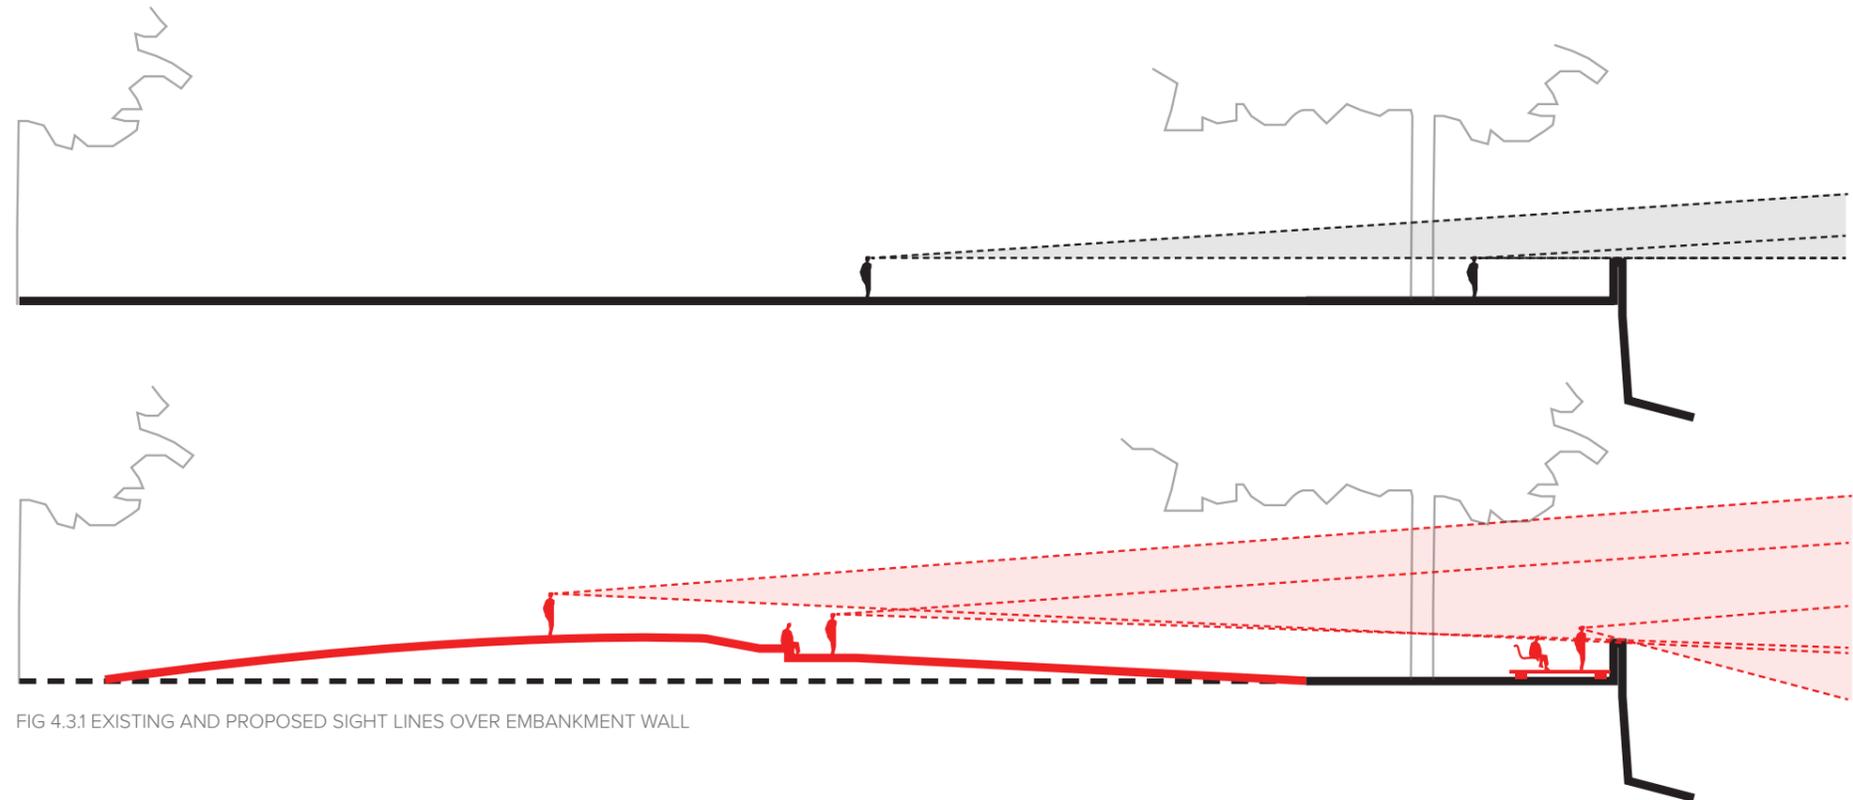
EXISTING AND PROPOSED SIGHT LINES OVER EMBANKMENT WALL
